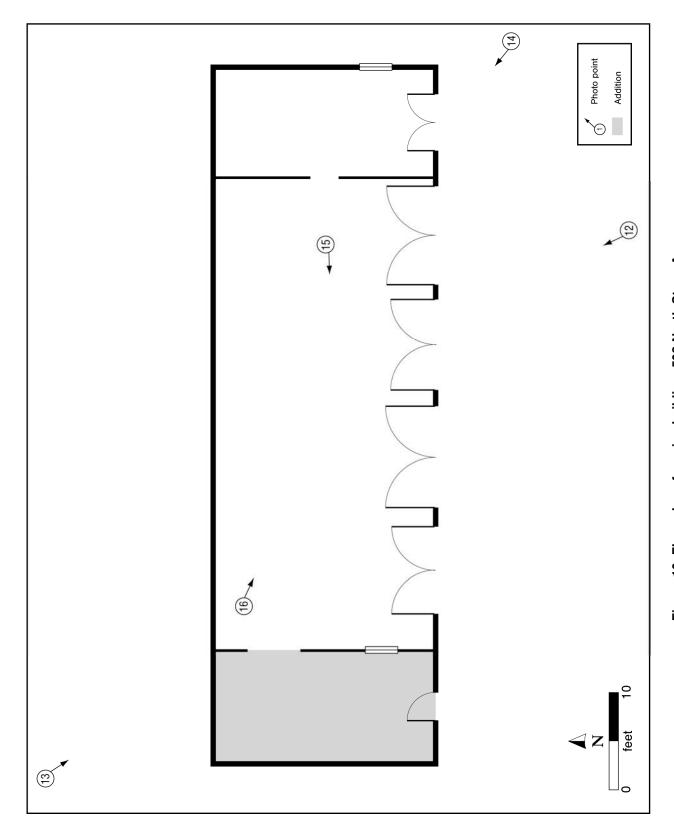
Floor plan of service building, 503 North Stone Avenue.
